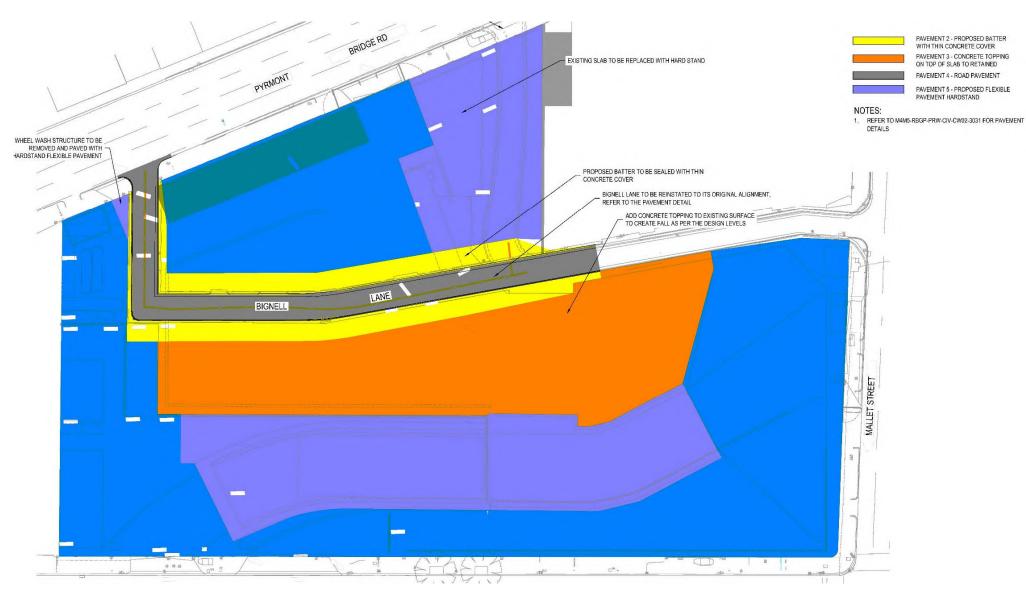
Pavement Plan for Reinstated Condition of PBR Site
